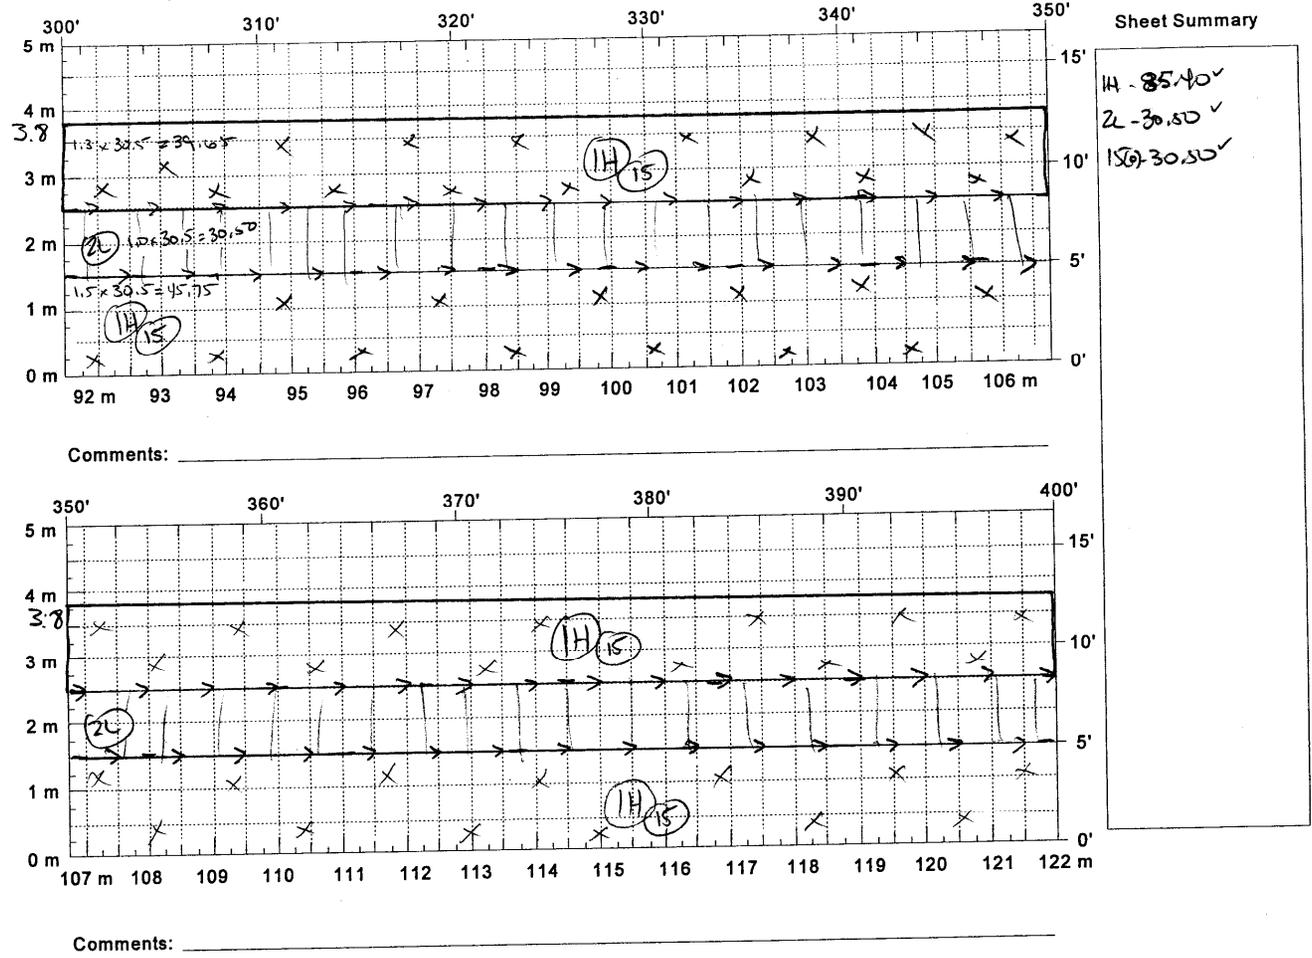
Pavement Distress Map; Station 3+00 to 4+00; Section 0505.
